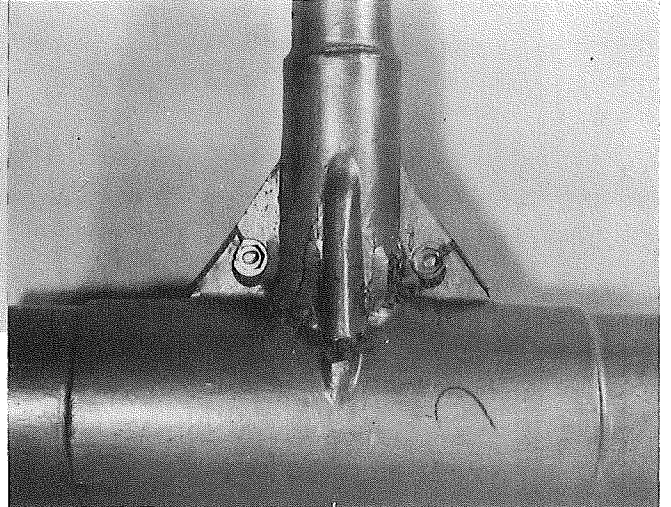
Typical failures of each of the two types of plastic fiberglass chord connections after ultimate tensile load tests, the chord-to-chord connection above and the diagonal-to-chord connection at right.
